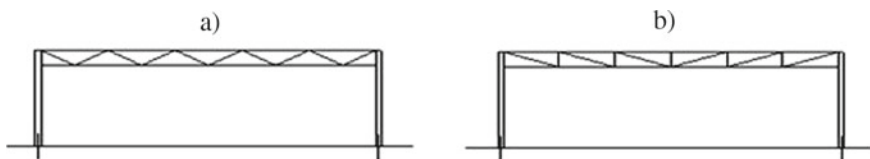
Truss schemes; a Xoy (V—truss); b Pratta (N-truss)
